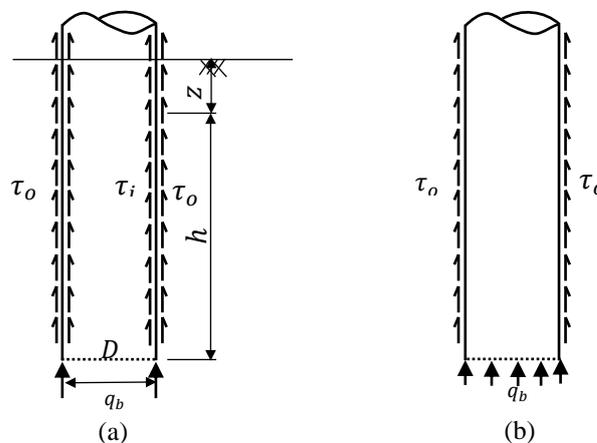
Load-transferring mechanism for tubular piles (a) unplugged case and (b) plugged case
